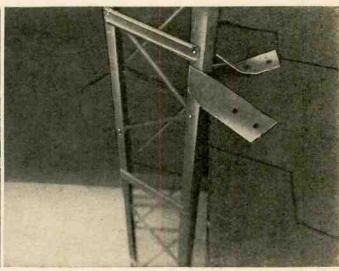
A sheet-metal strap is used to fasten tower to eaves of house, using heavy brass screws or lag screws.
